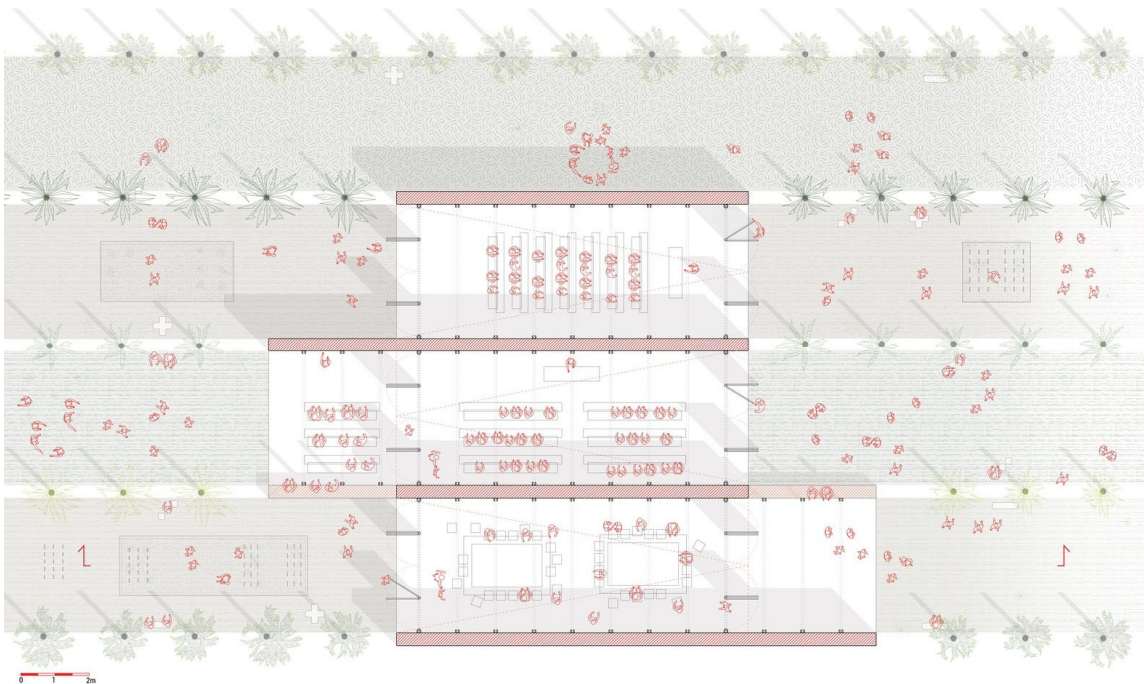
Floor Plan of InsideOut School (Tapia, 2020)
